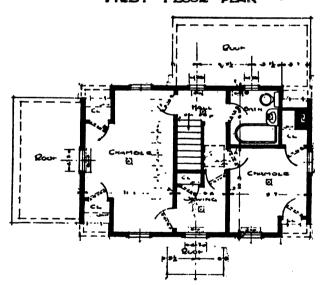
HOUSES SOLD UNDER PLAN NO. 2.
